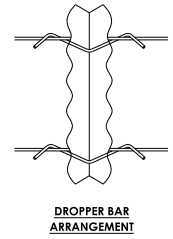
DETAILS ADOPED FROM ARAMCO STANDARD DETAILS AA-036678-001-01
